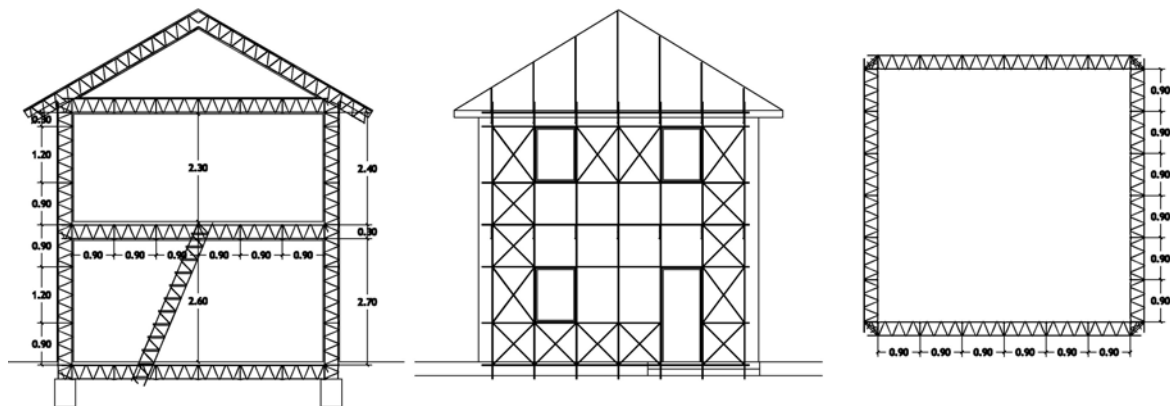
Type 5 house. a) Section with reinforcement trusses set in walls, slabs, roof and stairs; b) Elevation showing reinforcement prior to rendering; c) Plan showing wall reinforcement
